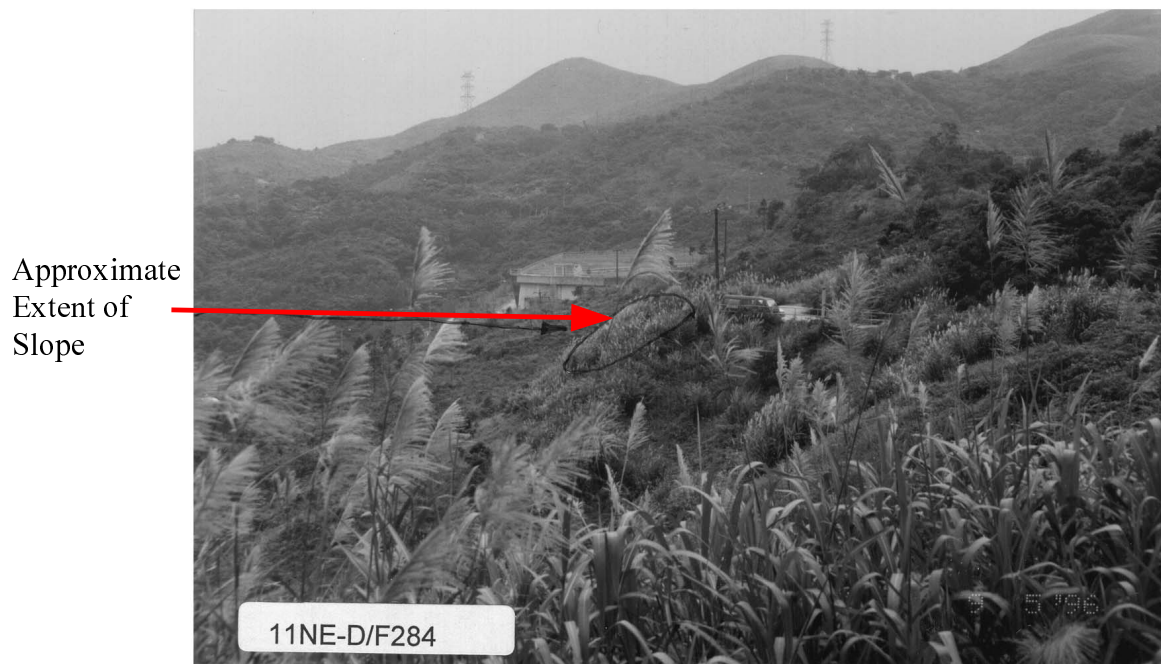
View South Towards Slope No. 11NE-D/F284 From Au Tau Village Road
